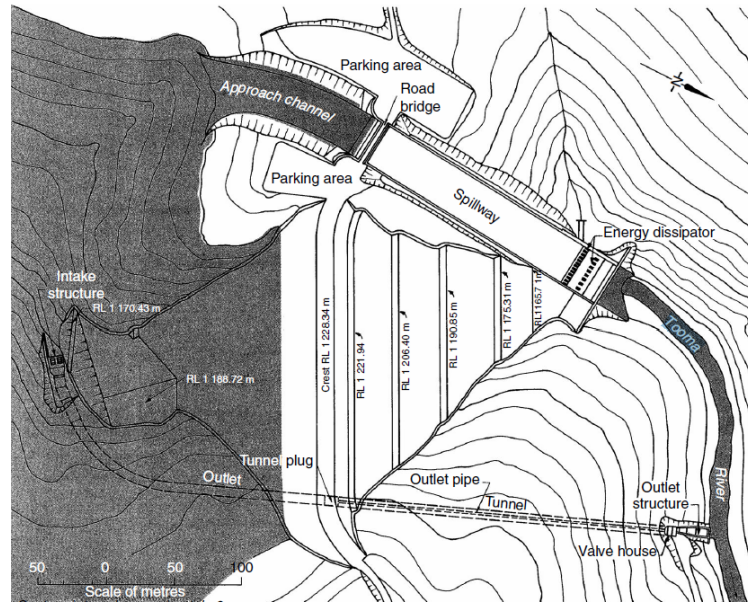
Plan view of Typical Embankment Dam utilizing Tooma Embankment (Fell, et al., 2015)
